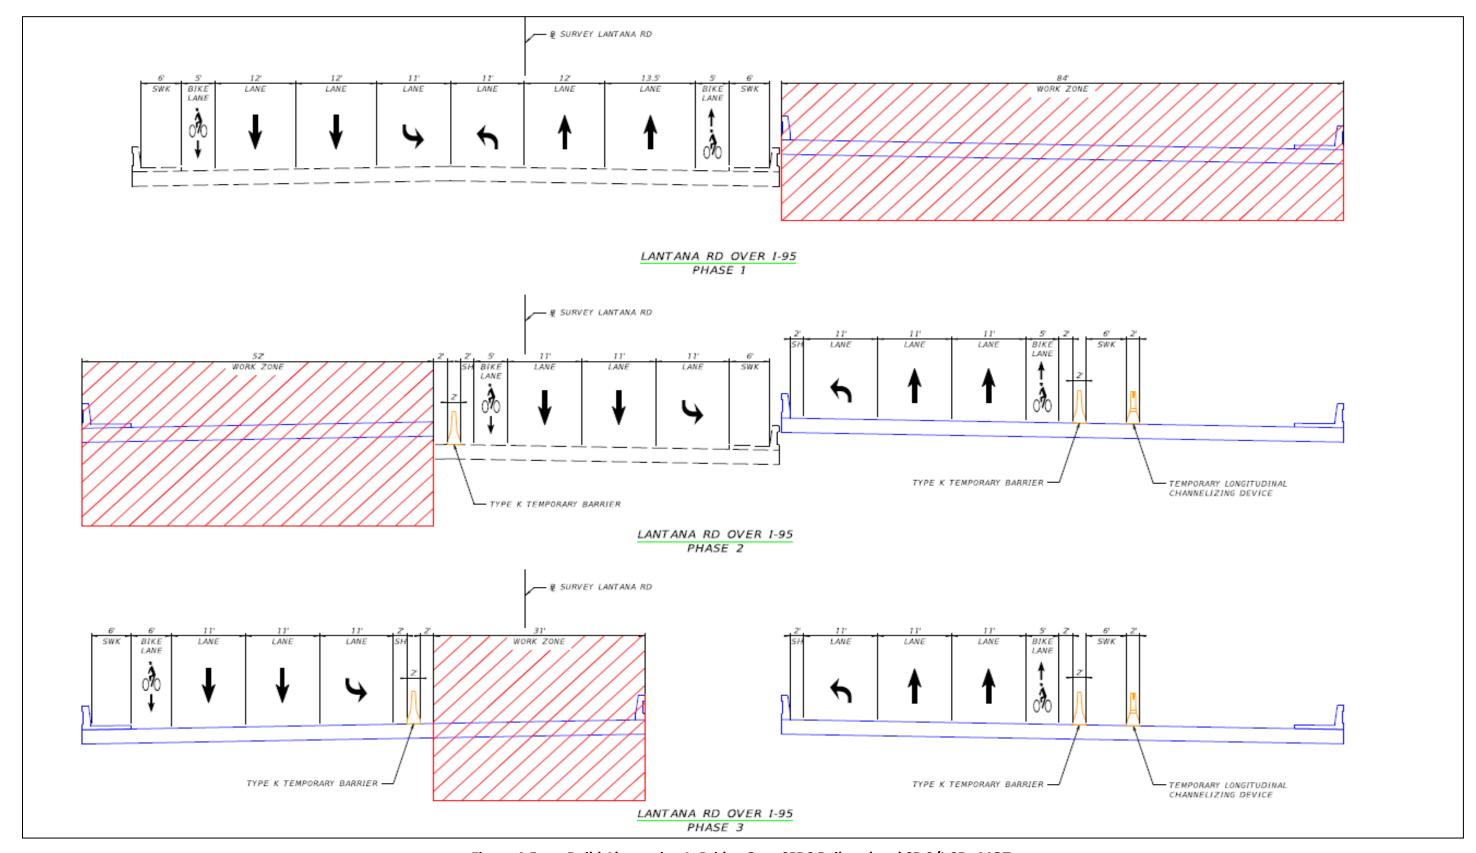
Build Alternative 1: Bridge Over SFRC Railroad and SR 9/I-95 - MOT
